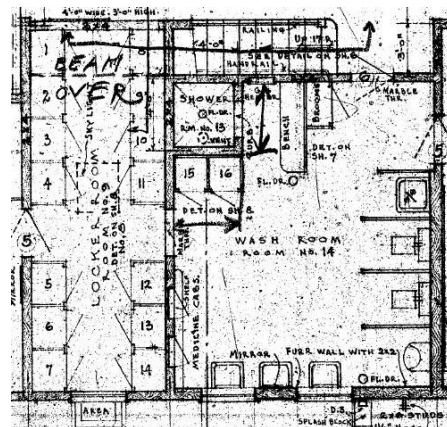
Drawing of wash room floor plan (W. Horace Austin, Sheet 8)
